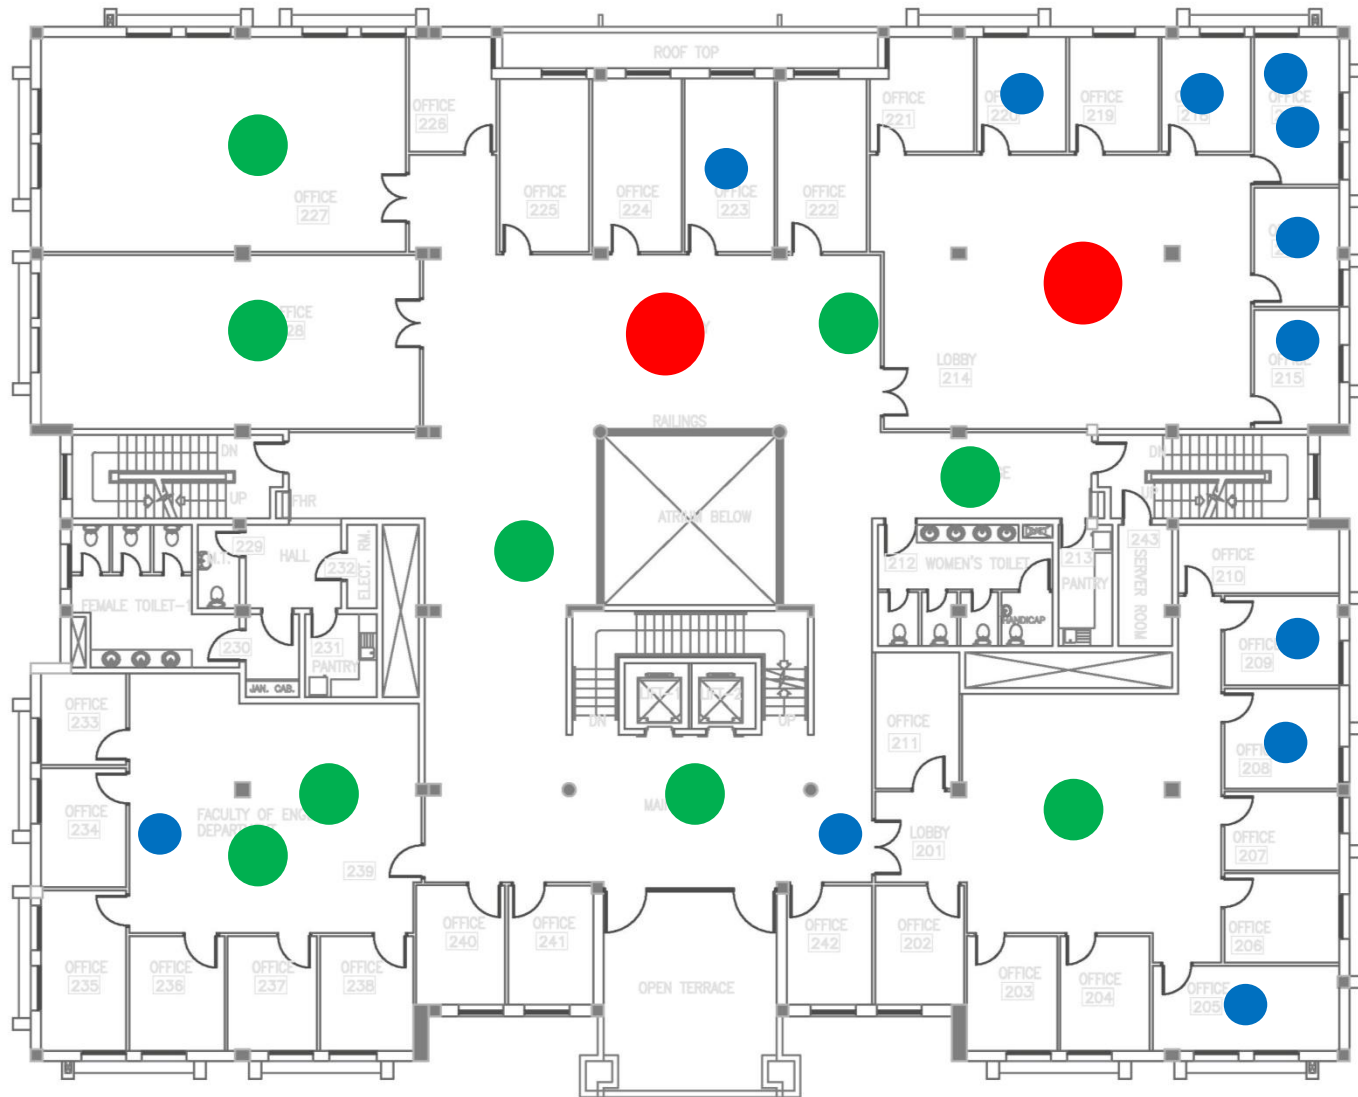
Women's foundation – First floor- 2:00-2:15pm
